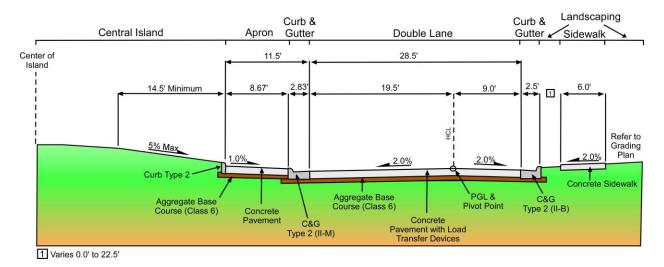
Typical Section of an Urban Double-Lane Roundabout
